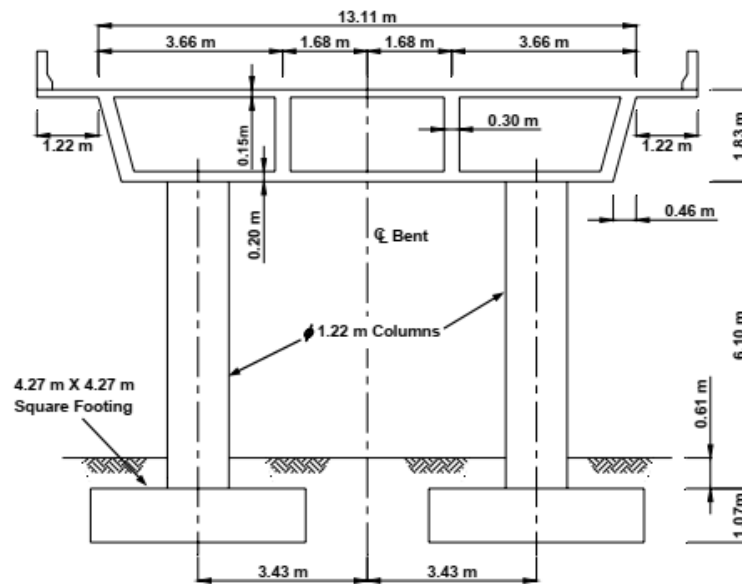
The cross section of the two-columns framed piers in FHWA Bridge #4 of [7].
